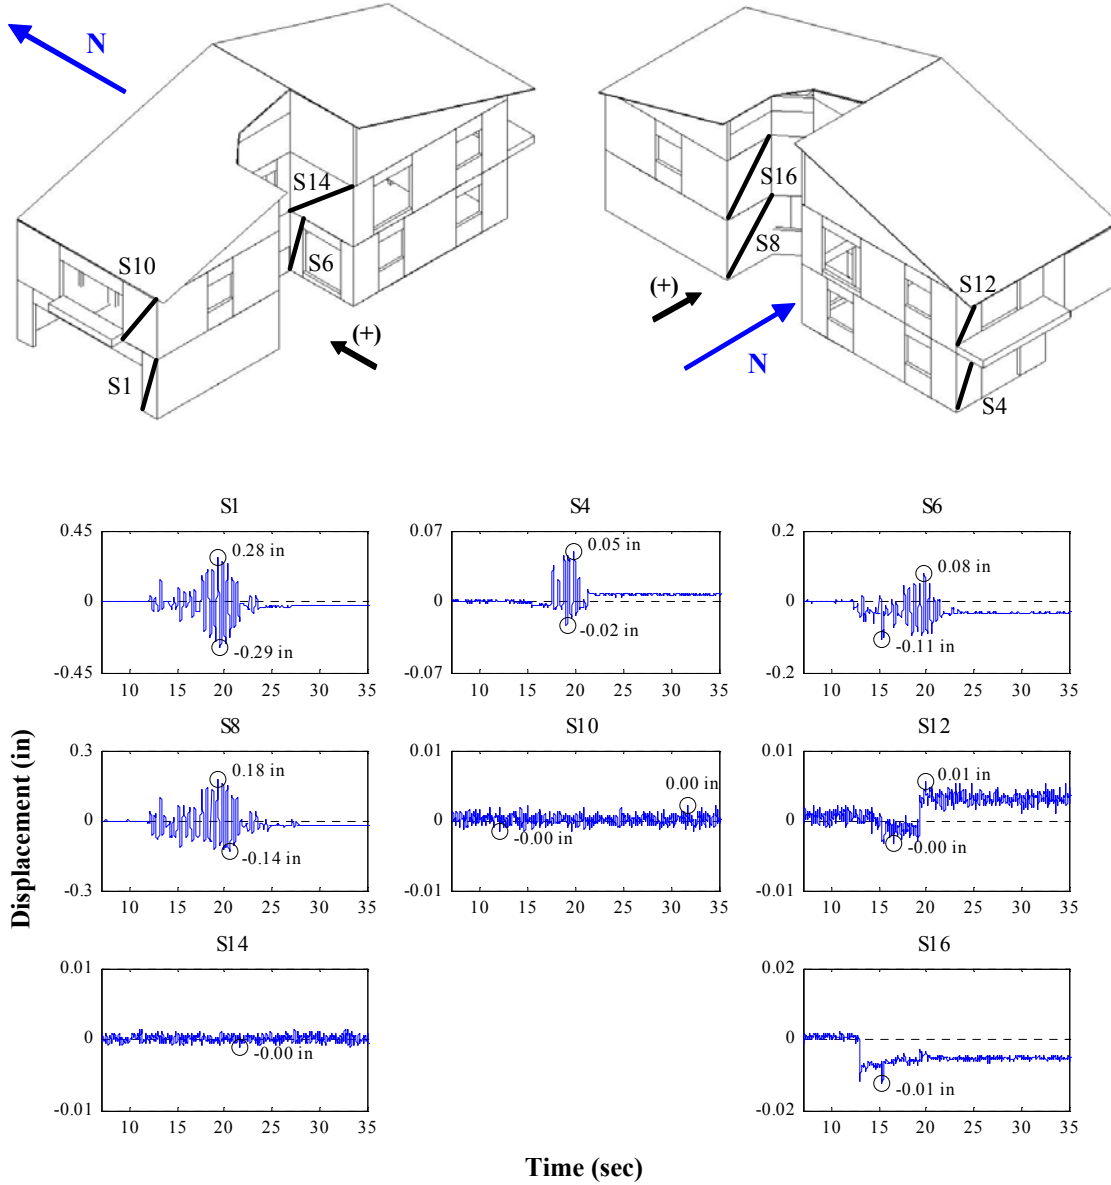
Wall deformations of north-south external walls for Test NWP5S03
